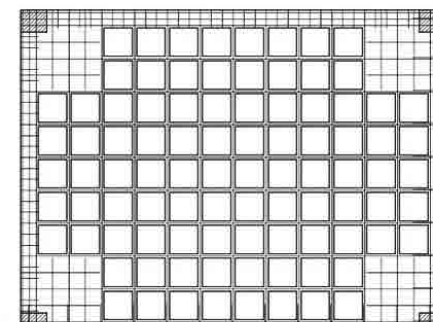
Lightweight slab on reinforced concrete pillars. Design by Fernando Ripollés.
